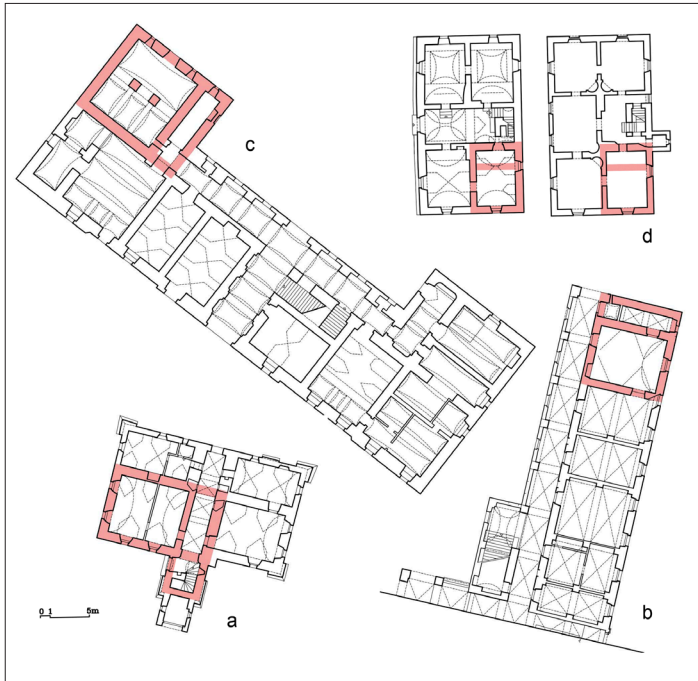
(a) Zagorska sela, Poklek Manor, ground-floor plan, drawing by M. Stepinac/IPU, 2001.; print: R. Mavar, 2016; (b) Veliki Bukovec Mansion, ground-floor plan, drawing: M. Stepinac/IPU, 1995/6.; print: R. Mavar, 2016; (c) Poznanovec Mansion, ground-floor plan, drawing: M. Stepinac/IPU, 2001.; print: R. Mavar, 2016; (d) Borkovec Manor, ground-floor plan (left), drawing: M. Stepinac/IPU, 2001.; print: R. Mavar, 2016; and the upper-floor plan (right), drawing: Ž. Burić after M. Bošnjak; print: R. Mavar, 2016.
